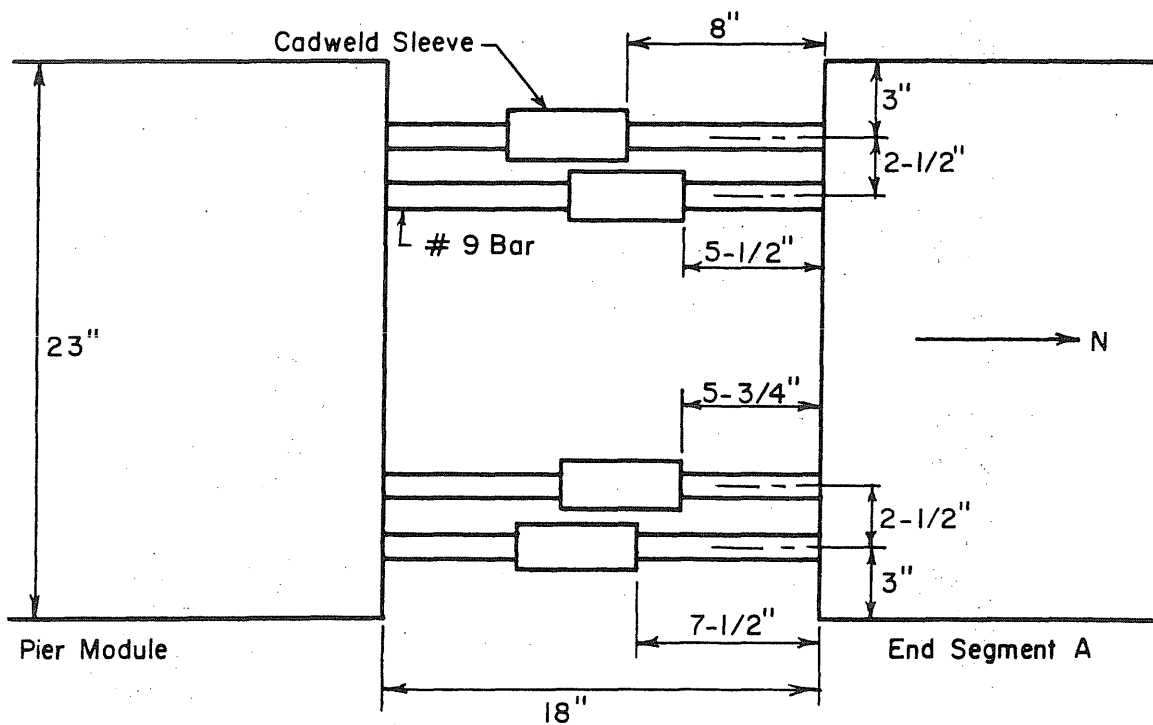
SECTIONS SHOWING REINFORCEMENT ARRANGEMENT AT SOUTH SPLICE
